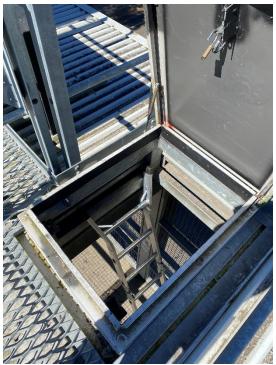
Secured access hatch in roof of pedestrian bridge.
